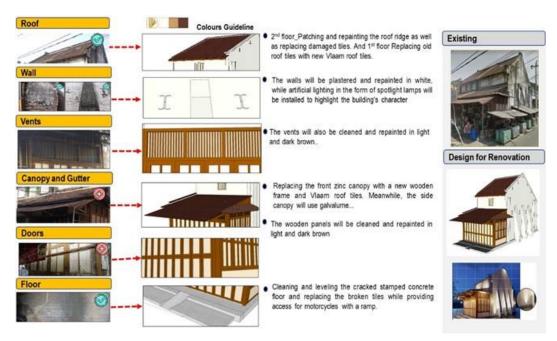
Identification of Facade Damage of the 41 Shop House Source: Author, 2023
